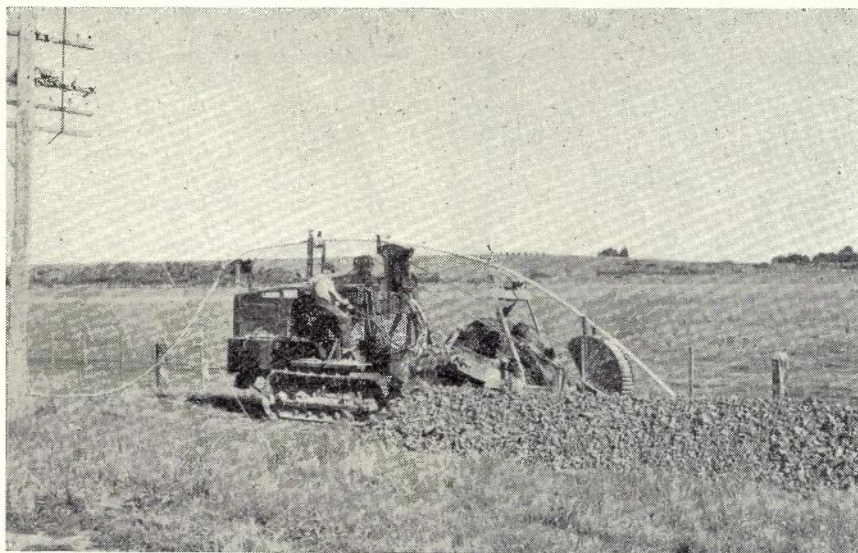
B.G.774 Ditcher fitted with rollers over the top, laying cable.
